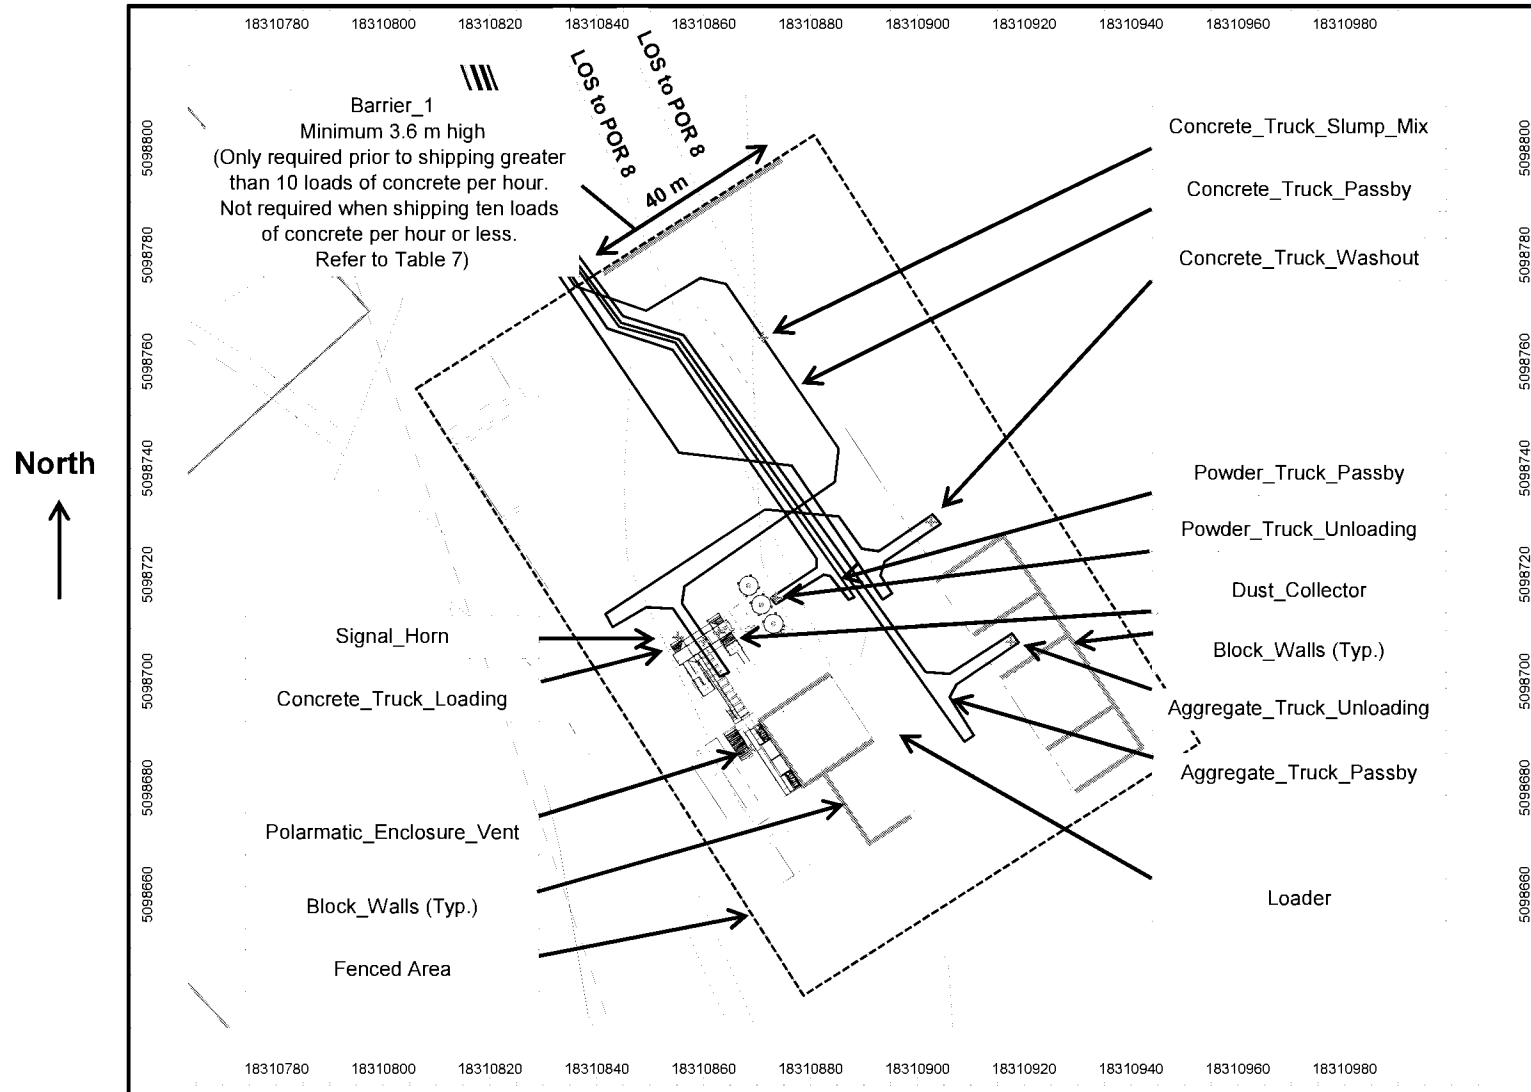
Detail Plan at PBC Plant showing Recommended Noise Barriers
